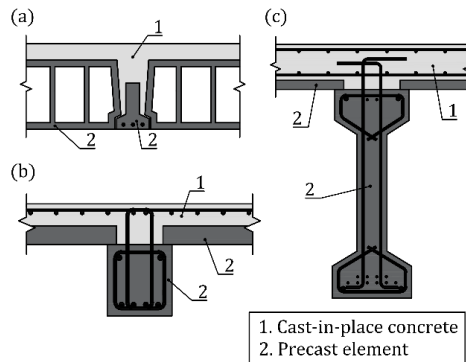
Examples of concrete composite beams in precast construction: (a) beam-and-block floor; (b) connection of precast beam and hollow-core slab filled with cast-in-place concrete; (c) precast bridge girder with cast-in-place slab.
